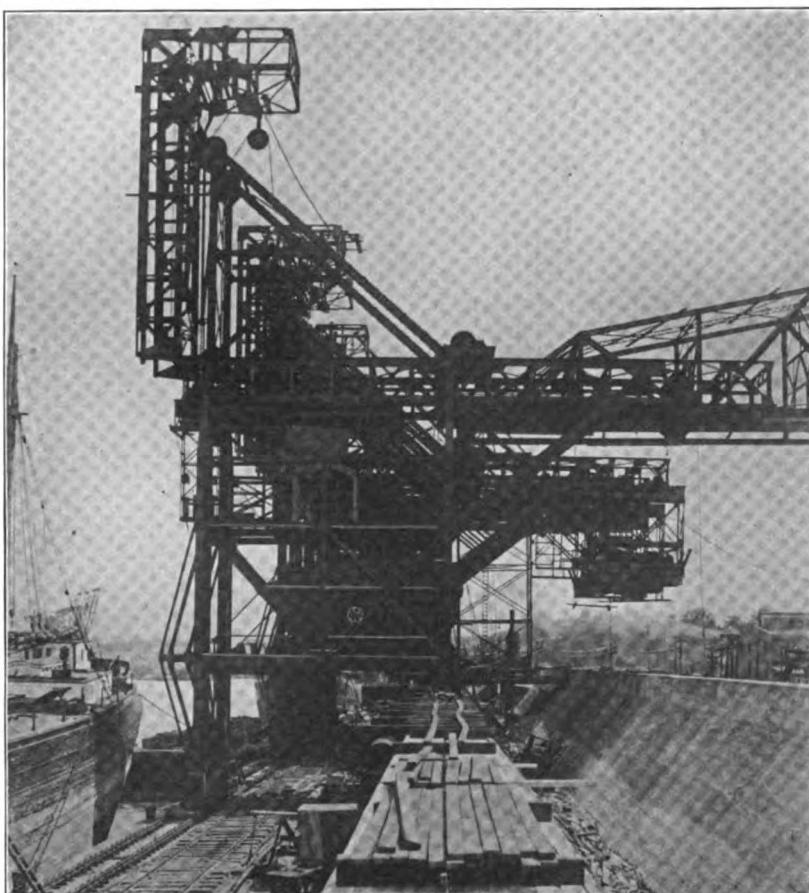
DETAILS OF CONSTRUCTION OF UNLOADERS, PHOTOGRAPH TAKEN JUNE, 1907.
